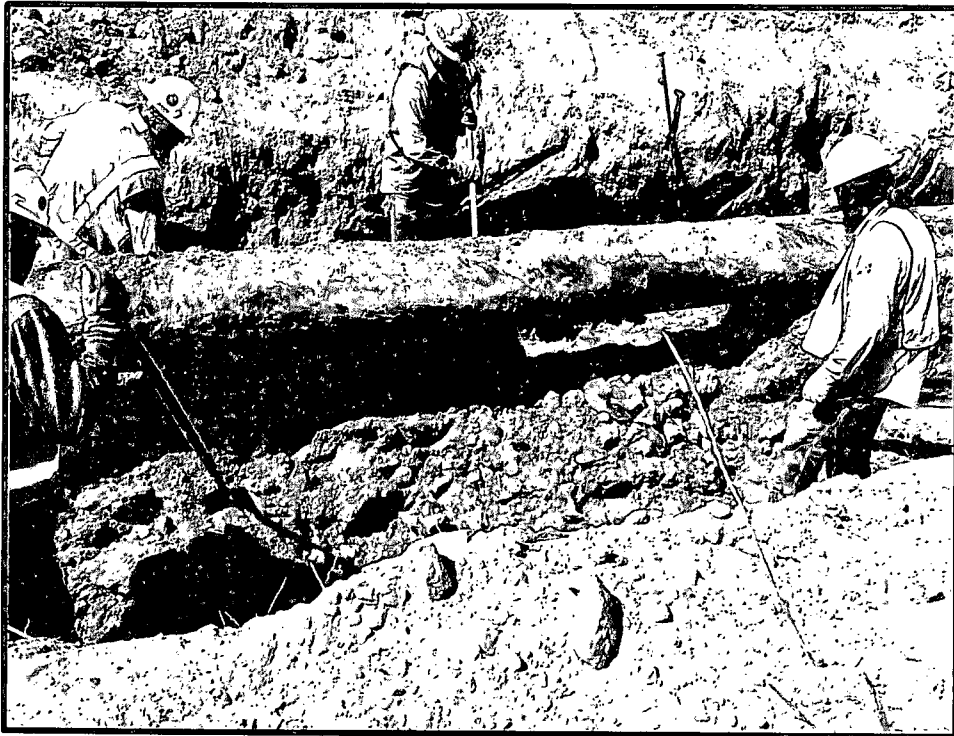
First stage of the Trunk K #2 pipeline excavation. Note extensive staining.
